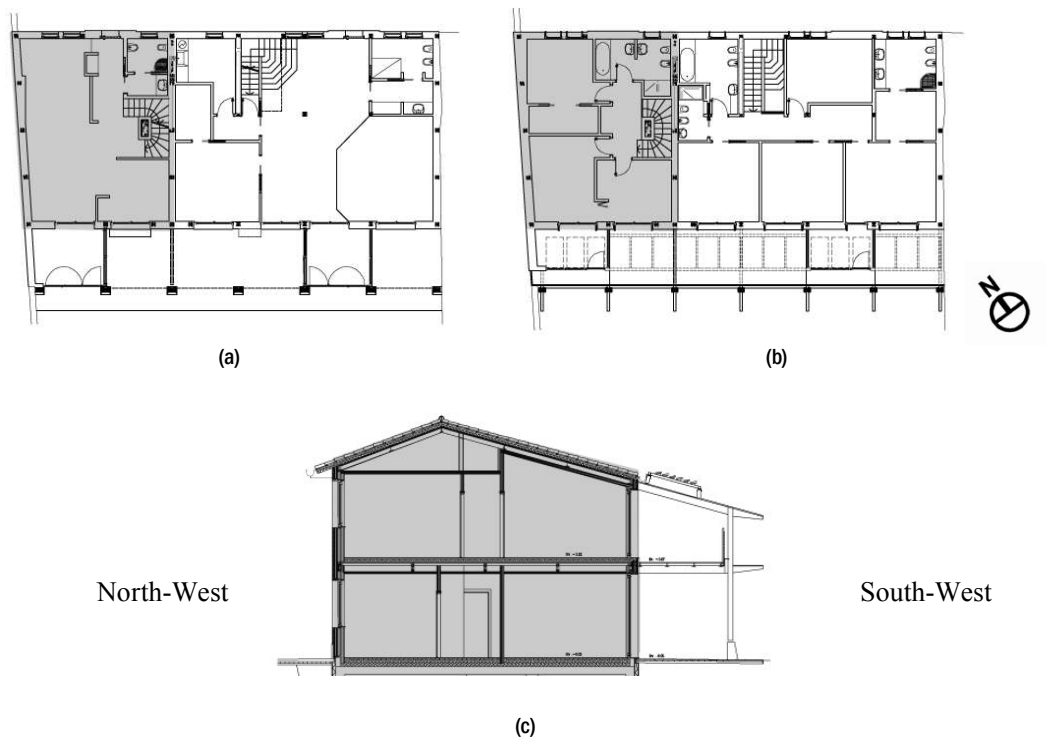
Plan of the first(a) and second floor (b) and the cross section of the building (c).
